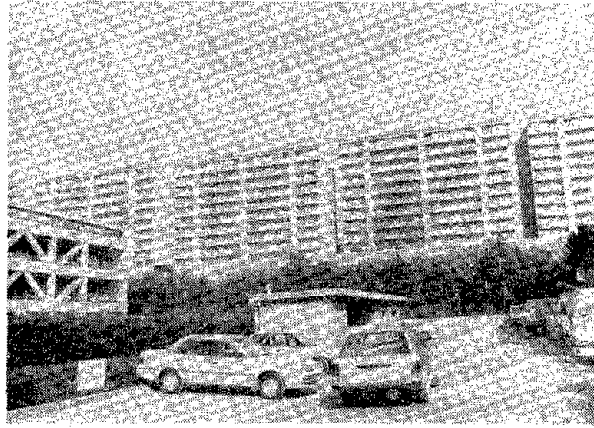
Modern reinforced concrete frame-wall construction on Port Island
